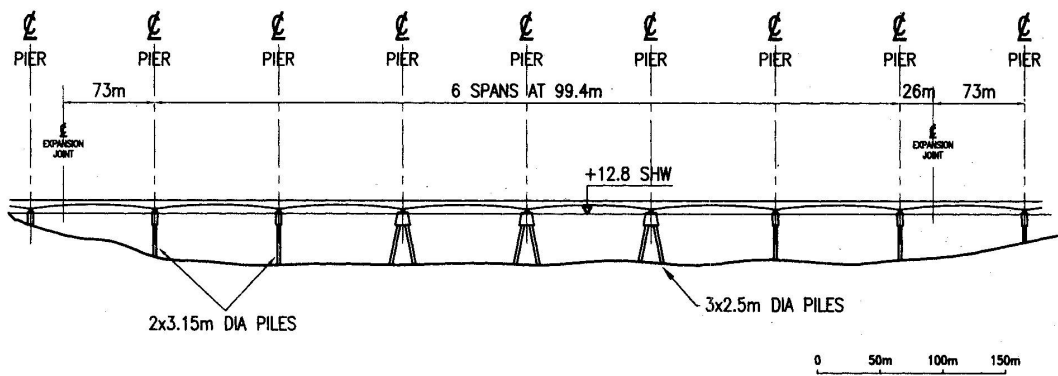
Elevation on 7-Span Module (overall length of main bridge 4.8km)
